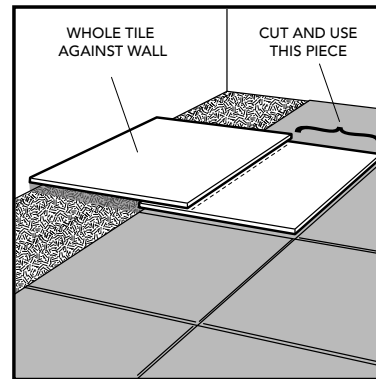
Use a full tile to measure the distance to the wall, making sure to subtract grout line width if installing a grouted floor
